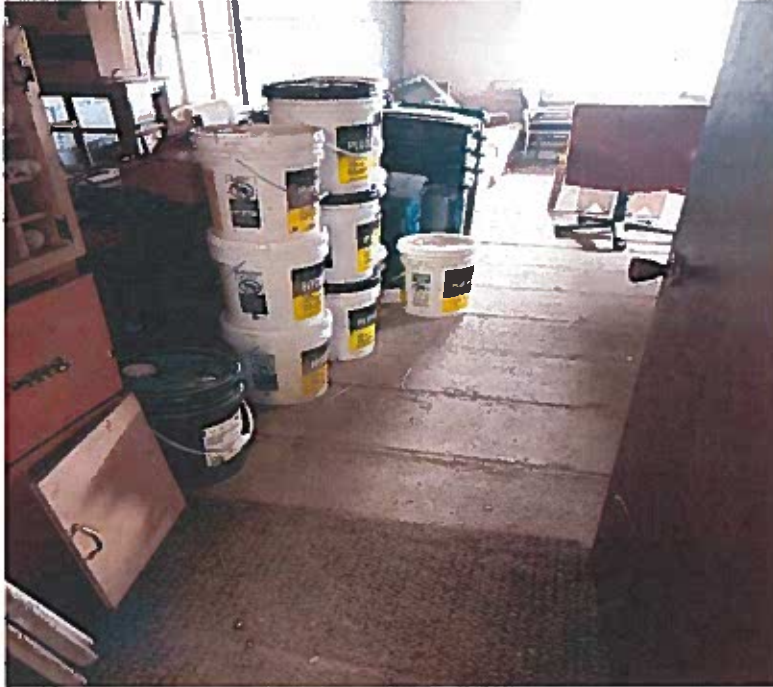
Concrete Precast Slab Second Floor Over Office Area Below
